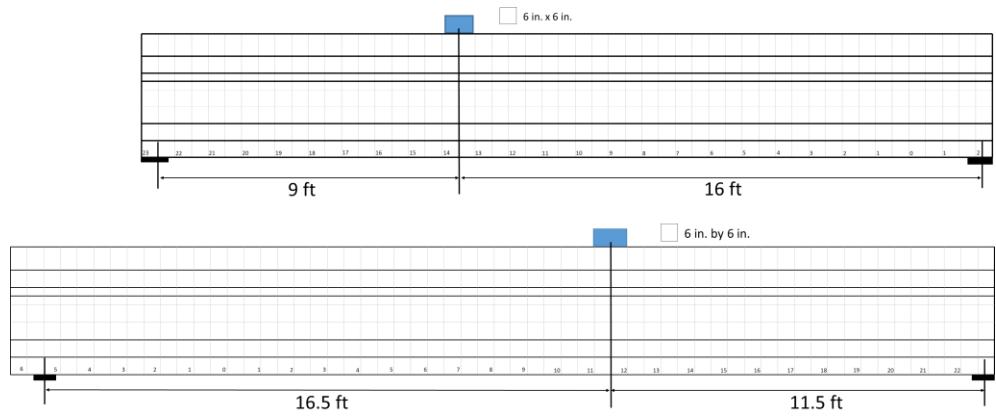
Girder C loading configurations (test C1 top, test C2 bottom)
